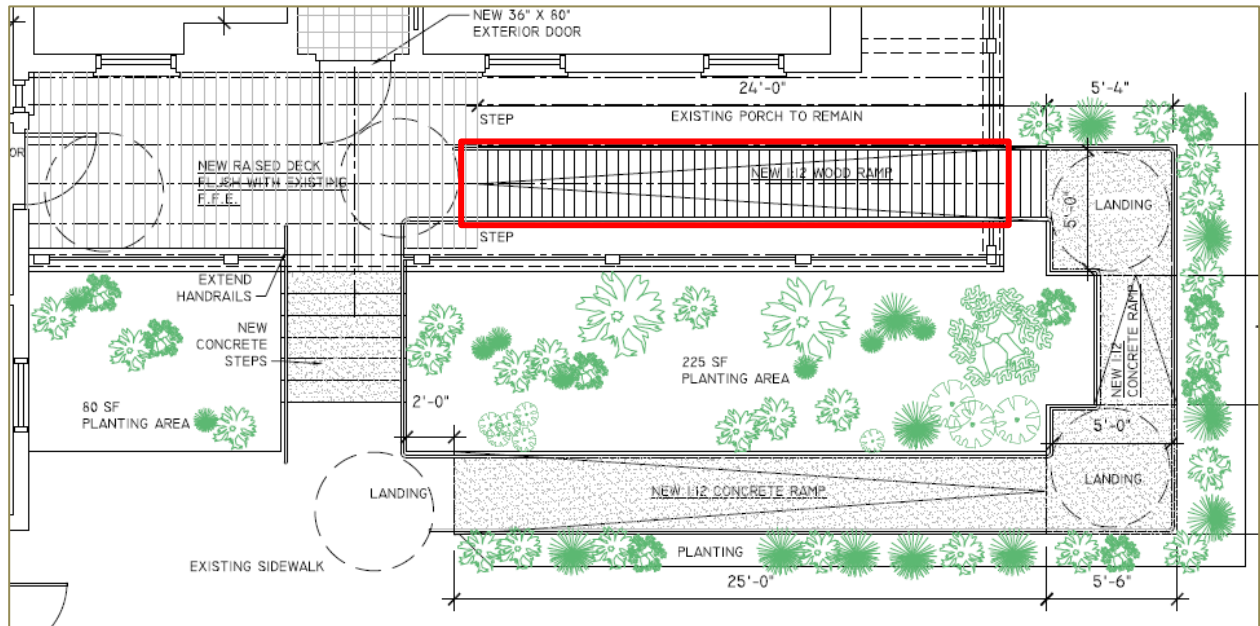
Image of the proposed site plan submitted by the Applicant. The area of the porch proposed to be altered to accommodate a ramp is outlined in red.
